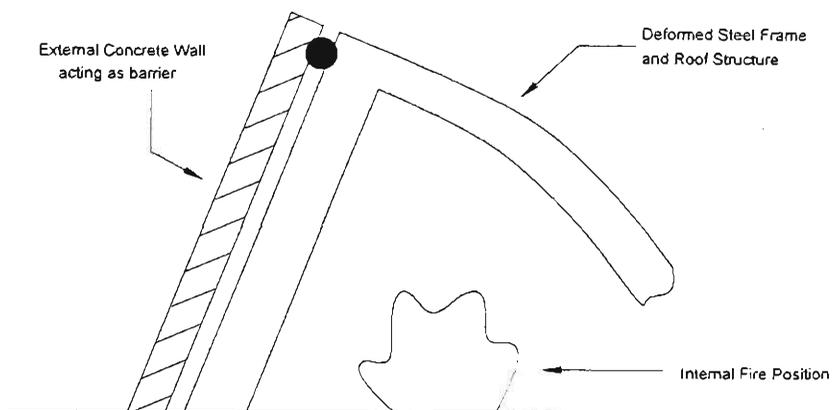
Possible Deformed Shape of Single-Storey Industrial Building
